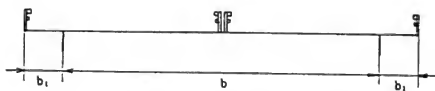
π type floor deck ($b=0.7B$, $b_1=0.1B$)
